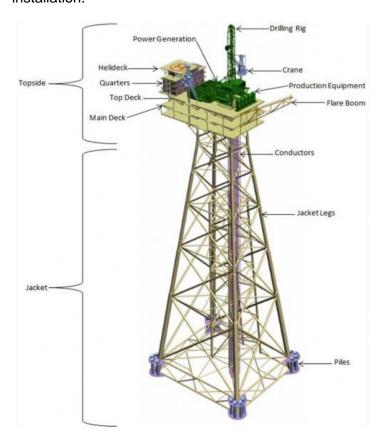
Diagram of a typical Steel Piled Jacket platform
